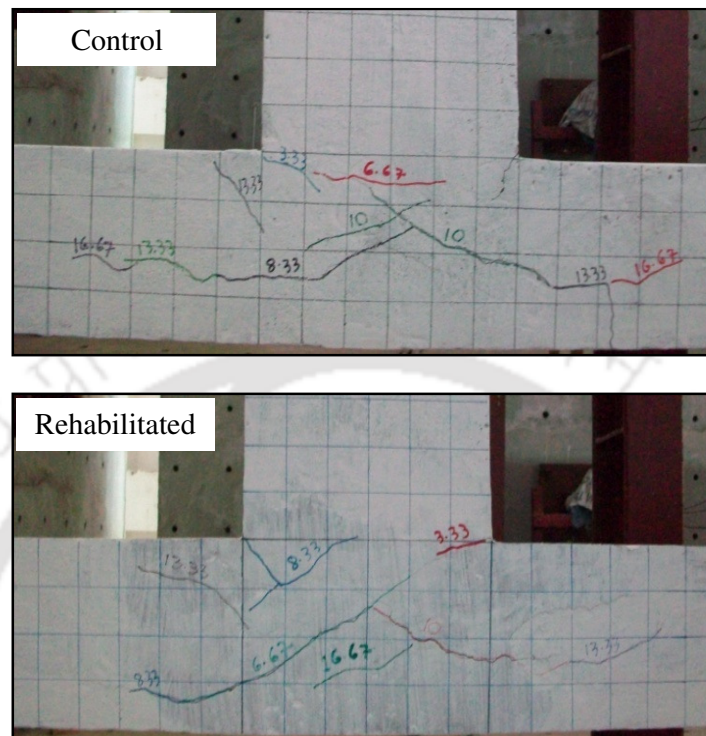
Cracks appearance for CWSM specimens during initial stages of loading under loading type-2
